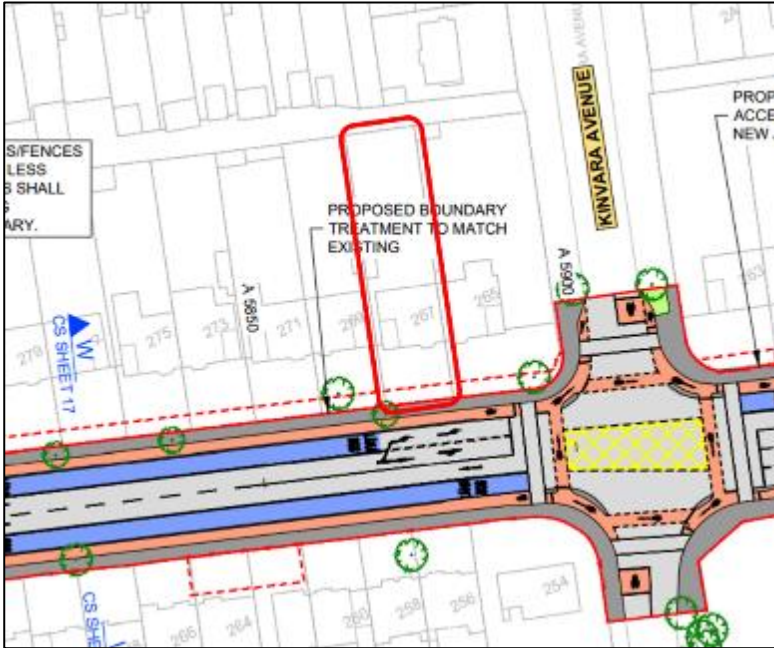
Proposed new Layout at 267 Navan Road
